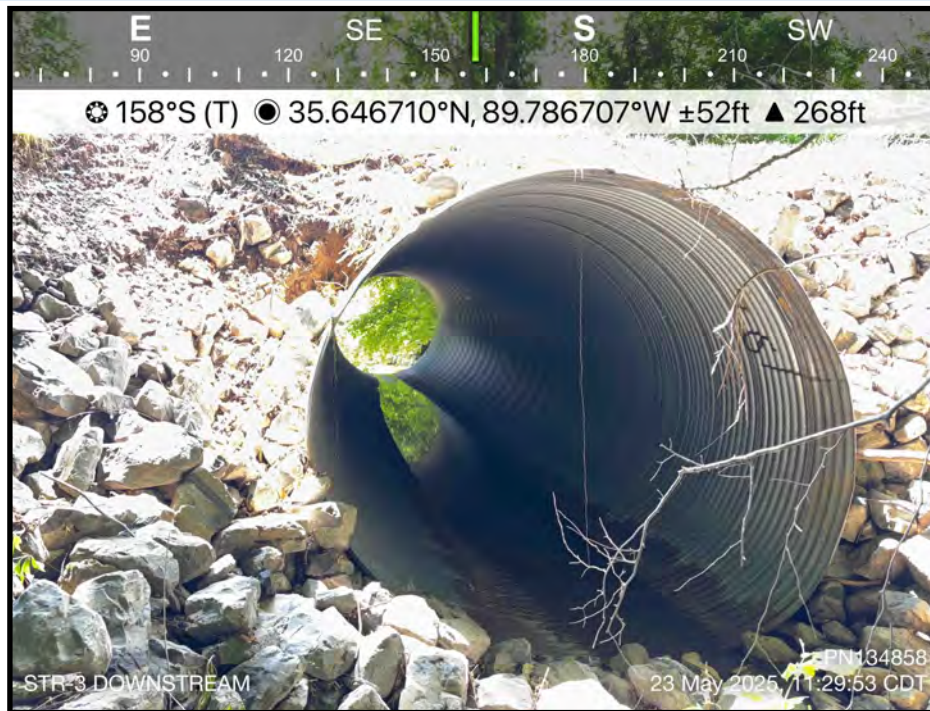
STR-3 downstream under TN-87; Culvert 10'
